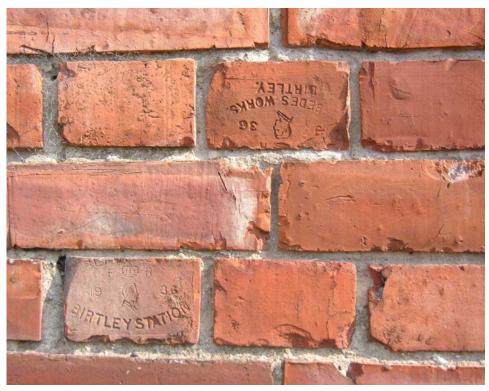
Gym block, north elevation (west end), detail of brick stamps, from the north.
